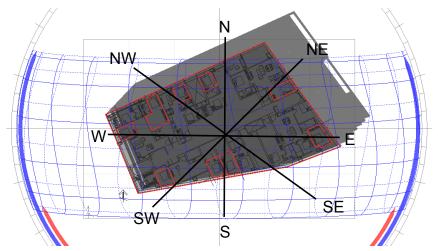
c Typical floor plan Solar penetration on 21 December
